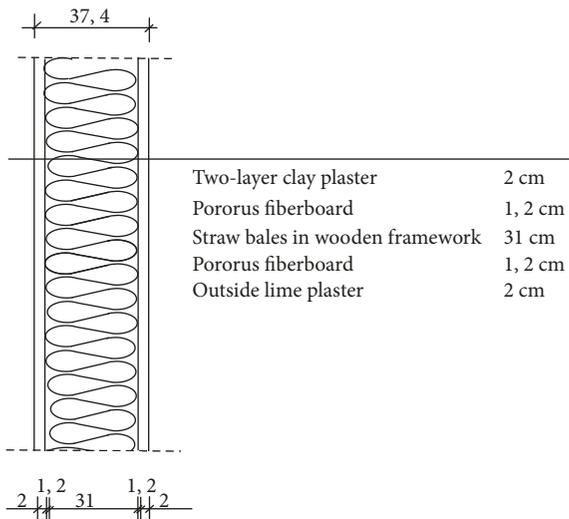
Cross section of the wall made in the straw-bale technology.
